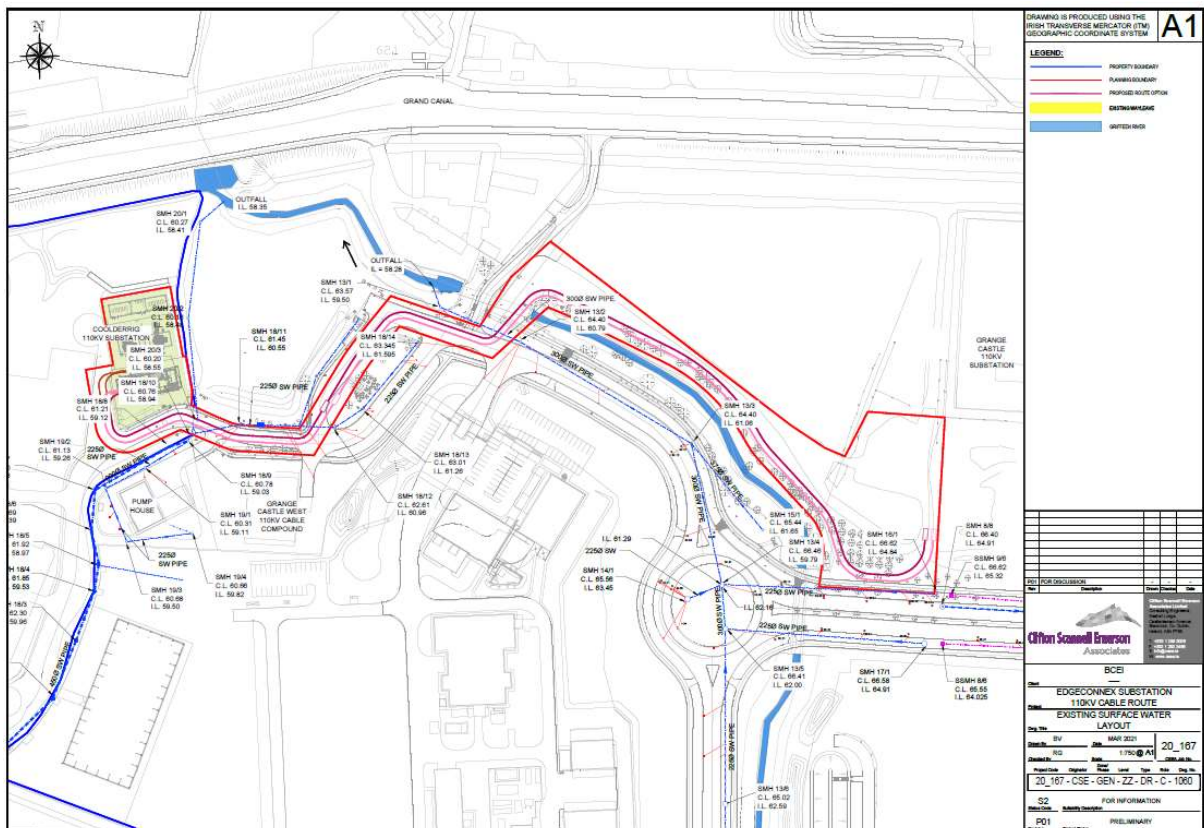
Overall Existing Surface Water Layout Plan DWG NO 20\_167-CSE-GEN-ZZ-DR-C-1060
